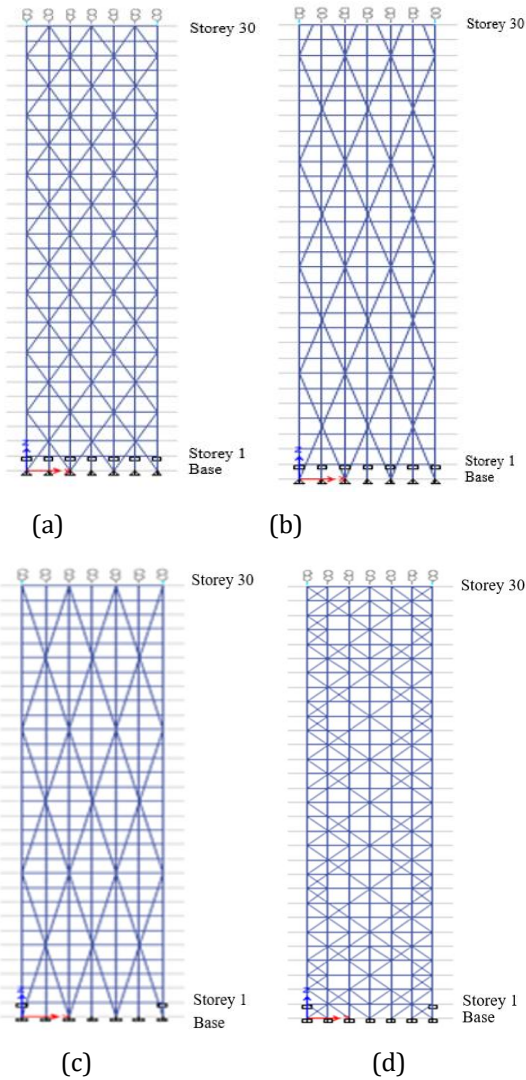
Typical floor plan, elevation of Diagrid system. Elevation of building at -
